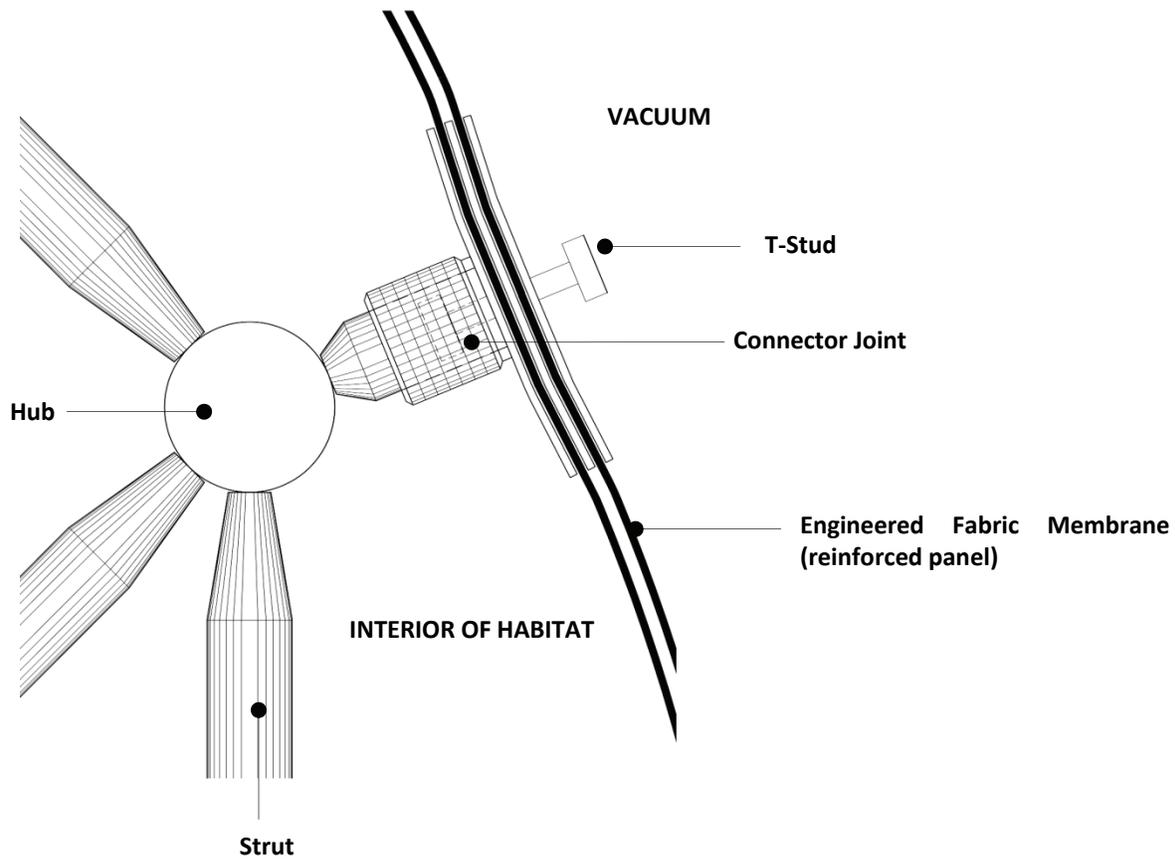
The rigid spaceframe is connected to the inflatable fabric structure using a modified stub strut that connect to “T-studs” that are fabricated to welded reinforced sections of the fabric. The T-Stud is continuous and formed with an internal plate that is welded within two mutually-welded restraining layers of fabric. It should be understood that all surfaces of this interface are fused chemically and there is no penetration of the fabric.
